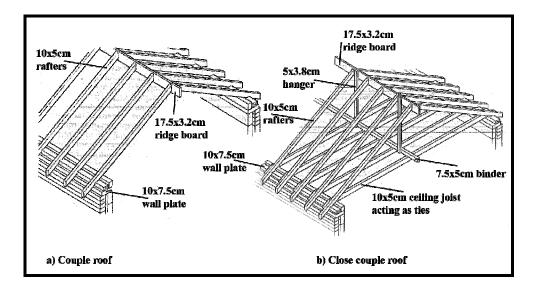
Ridge roofs are constructed in couple and close couple form (Foster, 1983:177).
